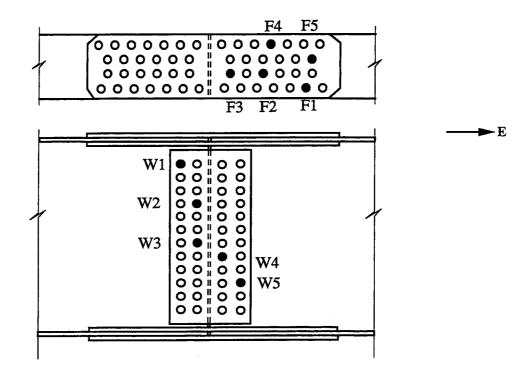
(a) Location of sampled bolts in connection E1 of bridge B3
